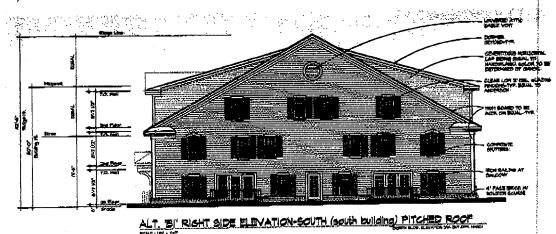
South Elevation (from City Place Site Plan submittal sheet A3.9b)
